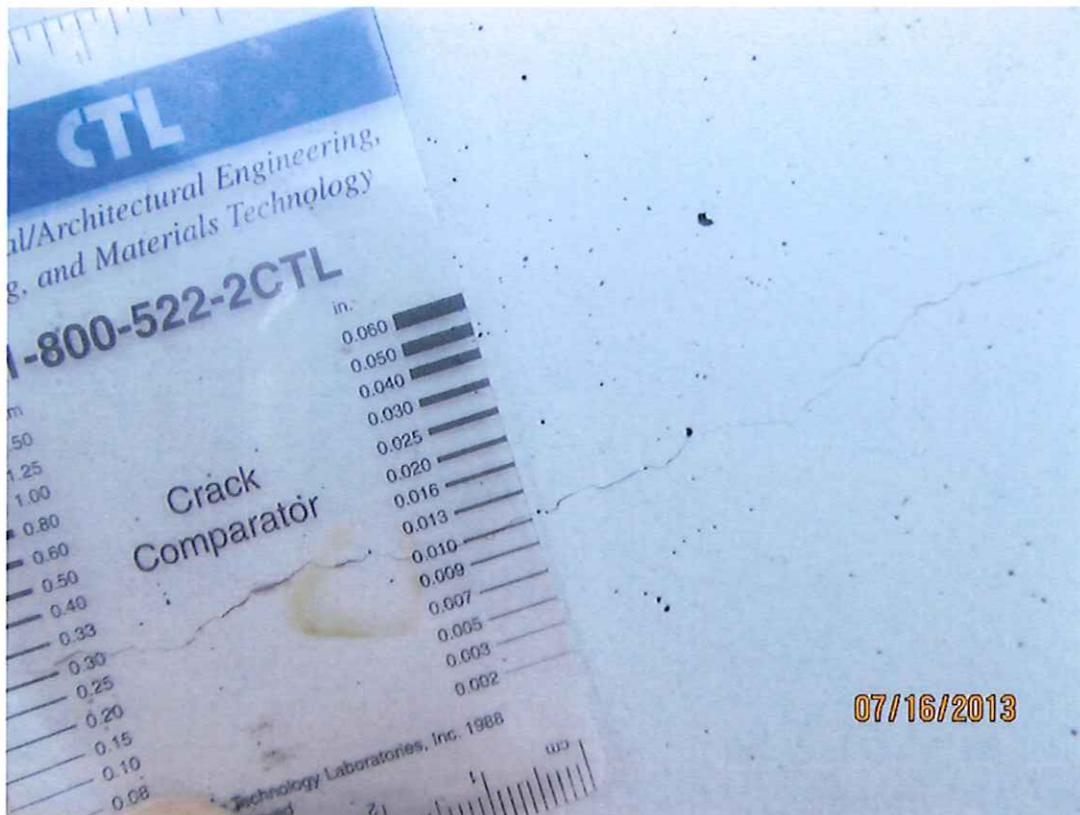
Typical width of cracks in the beam webs, top and bottom flanges
